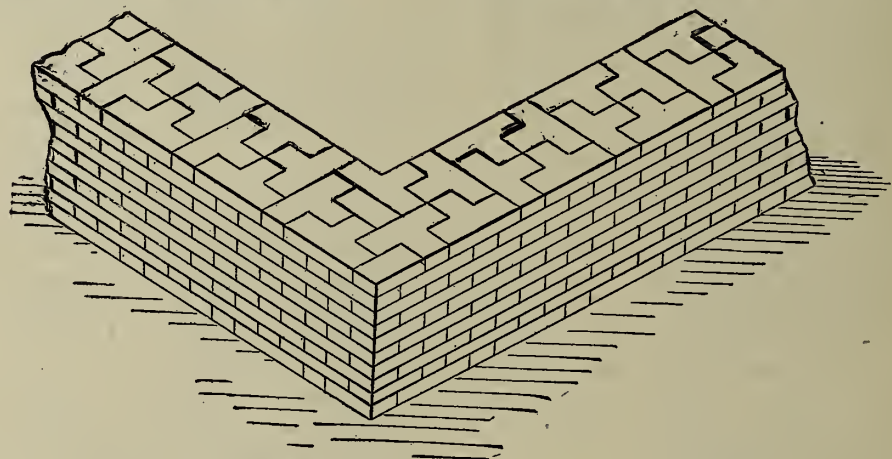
CHECKER FACE, 18-IN. WALL, COMMON BRICK ON CORNERS.
